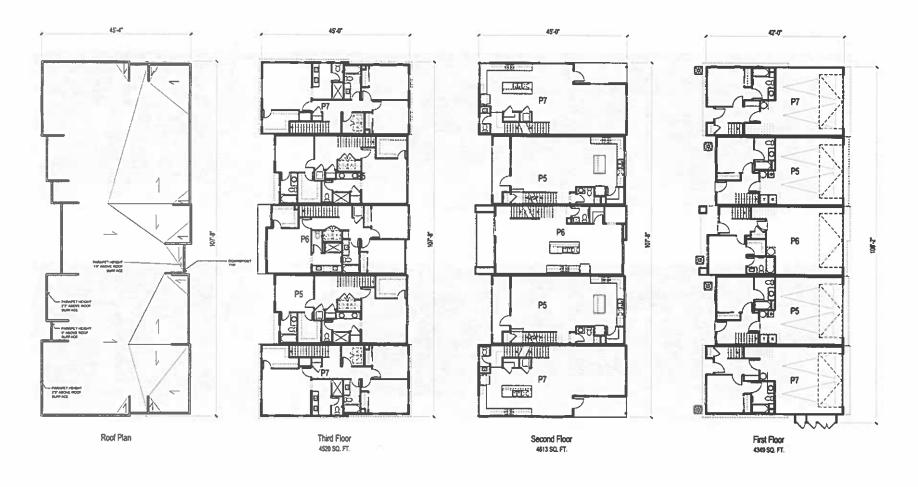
Conceptual Architecture - 5-Plex Building Floor Plan "E"
